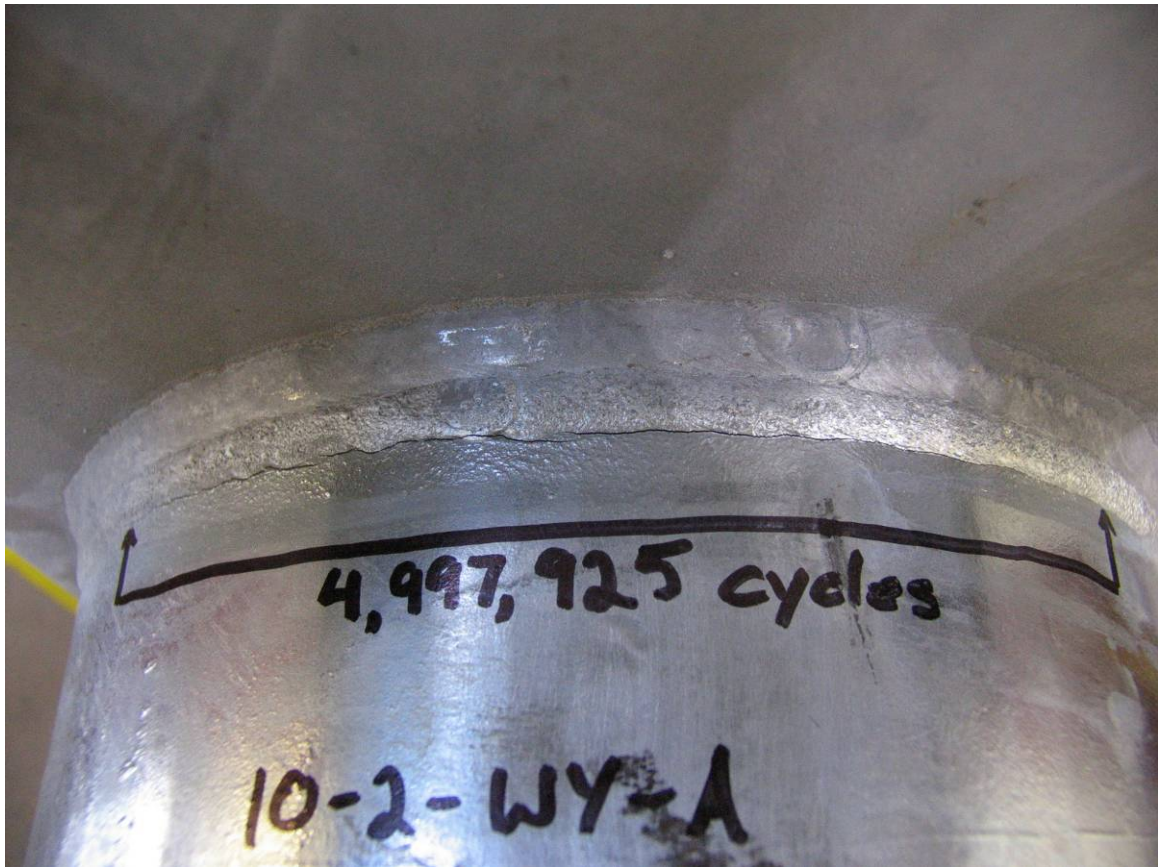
Typical Failure of the Full-Penetration Welded Specimens
